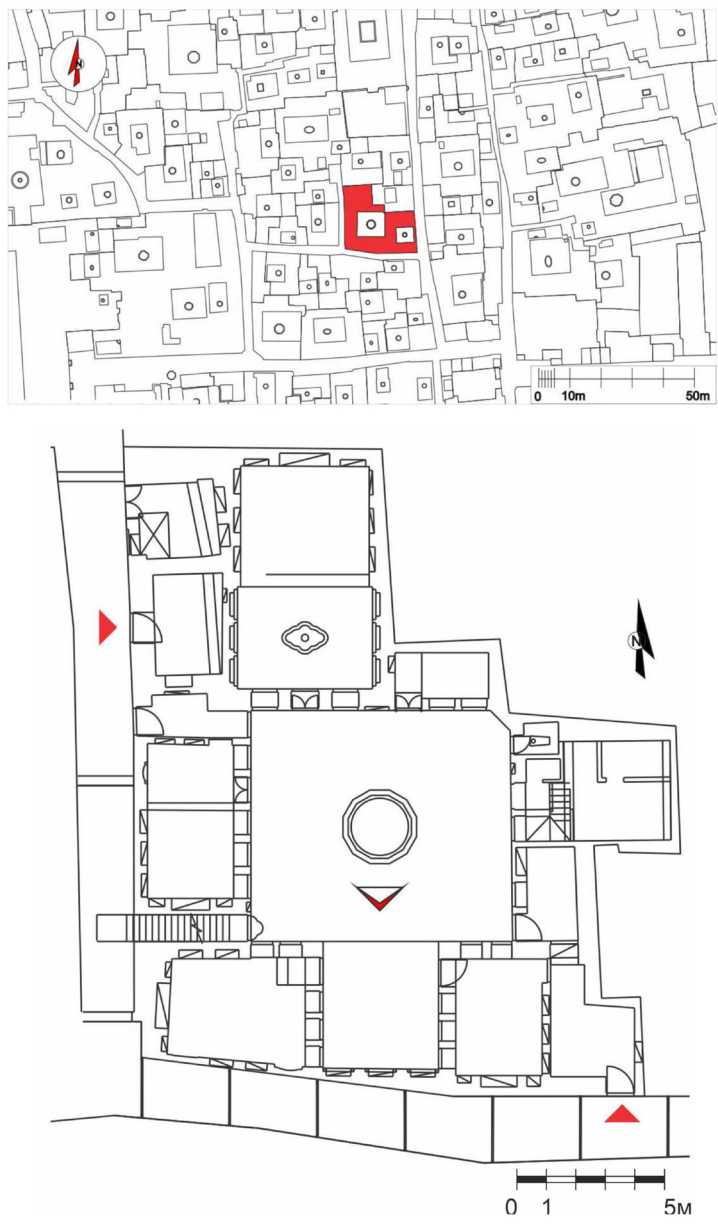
The al-Tawil house: cadastral plan situating the house and plan of the ground floor. Illustration by Mohammad Daruis and the author, 2012, CC BY-NC-ND.
